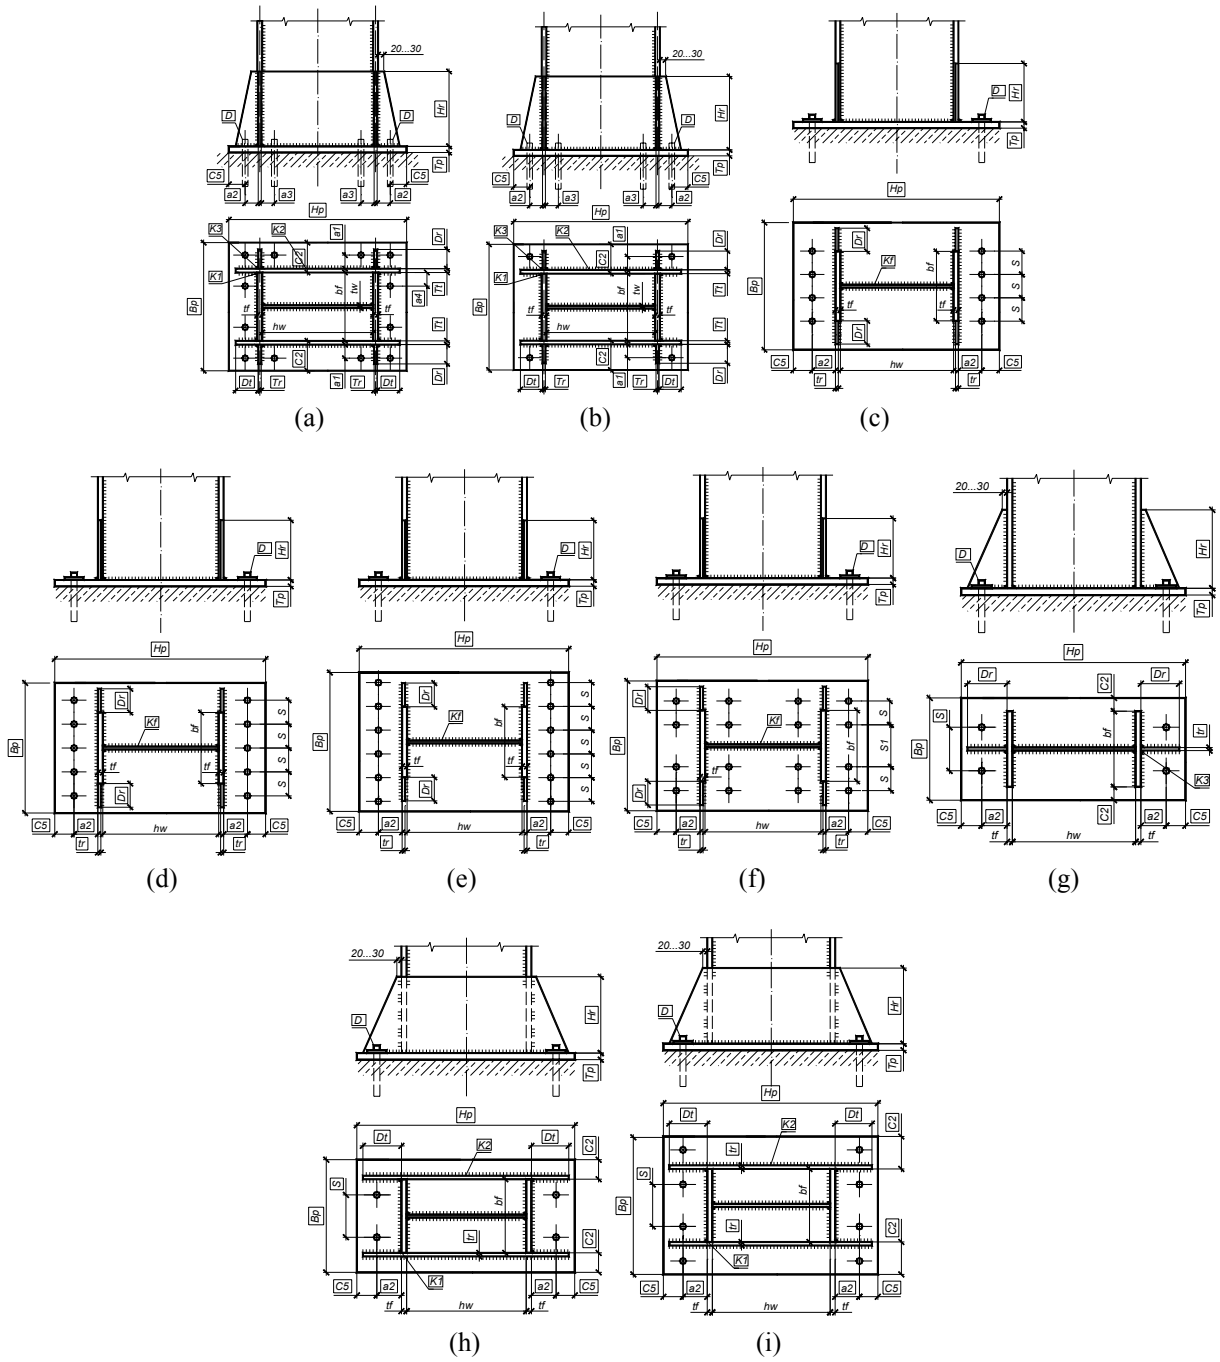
Structural schemes for rigid column bases with wing plates and stiffening ribs.
